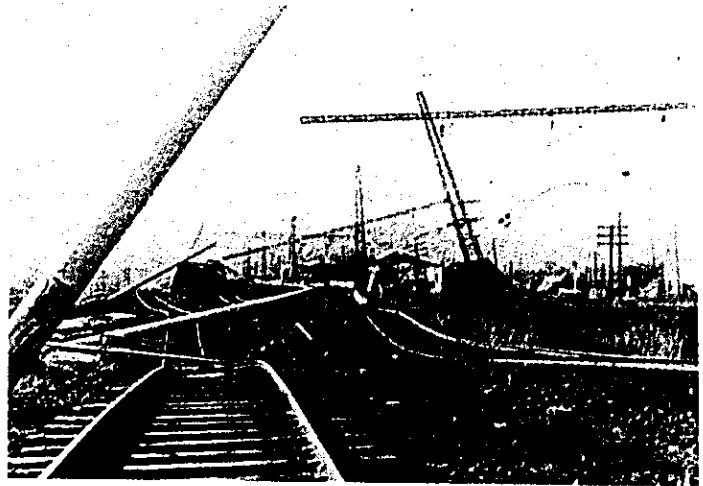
Railroad Bridge (suburban Yerevan, undamaged)
